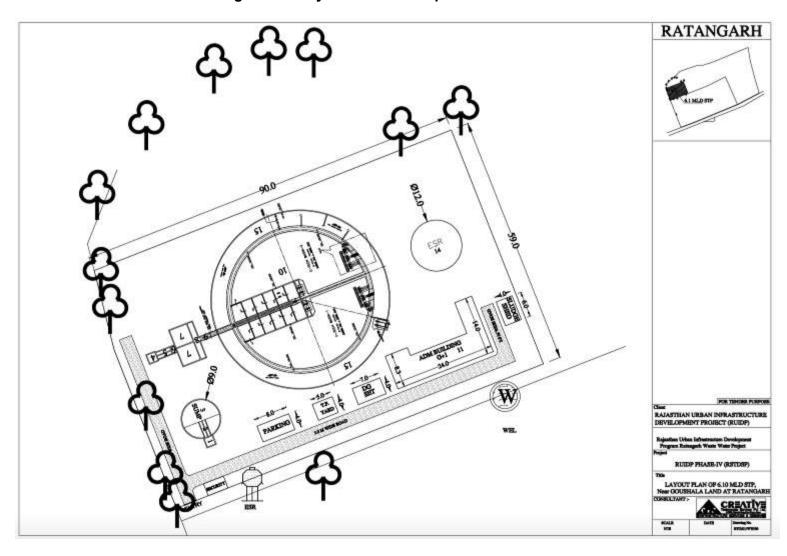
Layout Plan for Proposed STP 2 near Gaushala
